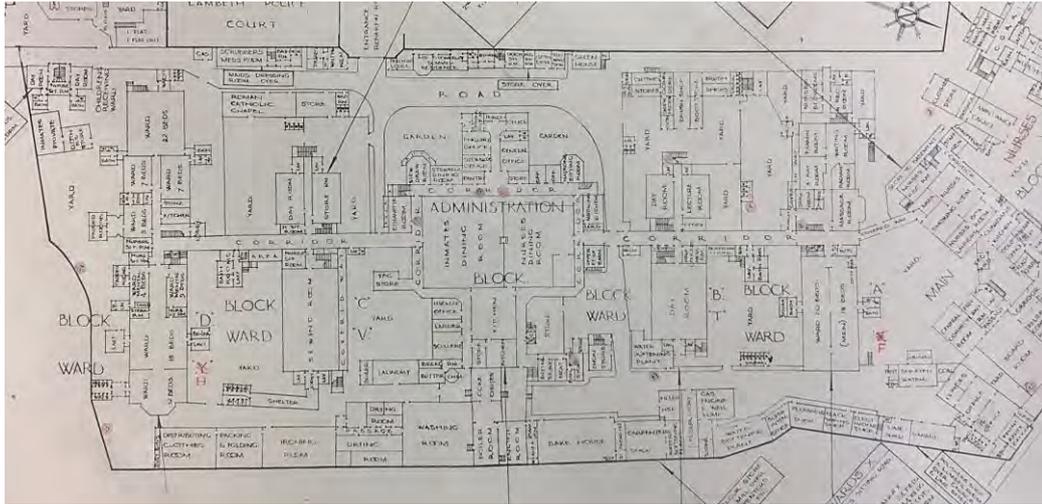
Detail from a plan of Lambeth Hospital, 1939
